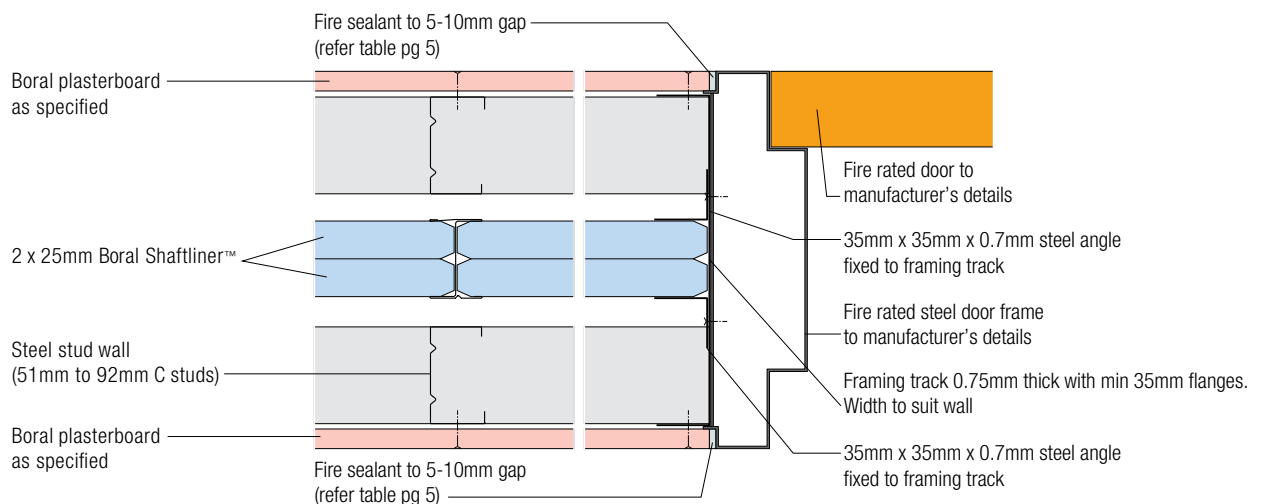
Shaftliner™ Panels to Door Junction Detail 3
